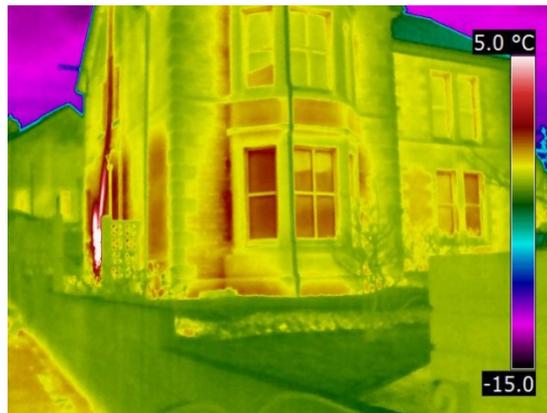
Solid stone wall dwelling, higher temperatures at bay window junctions.
